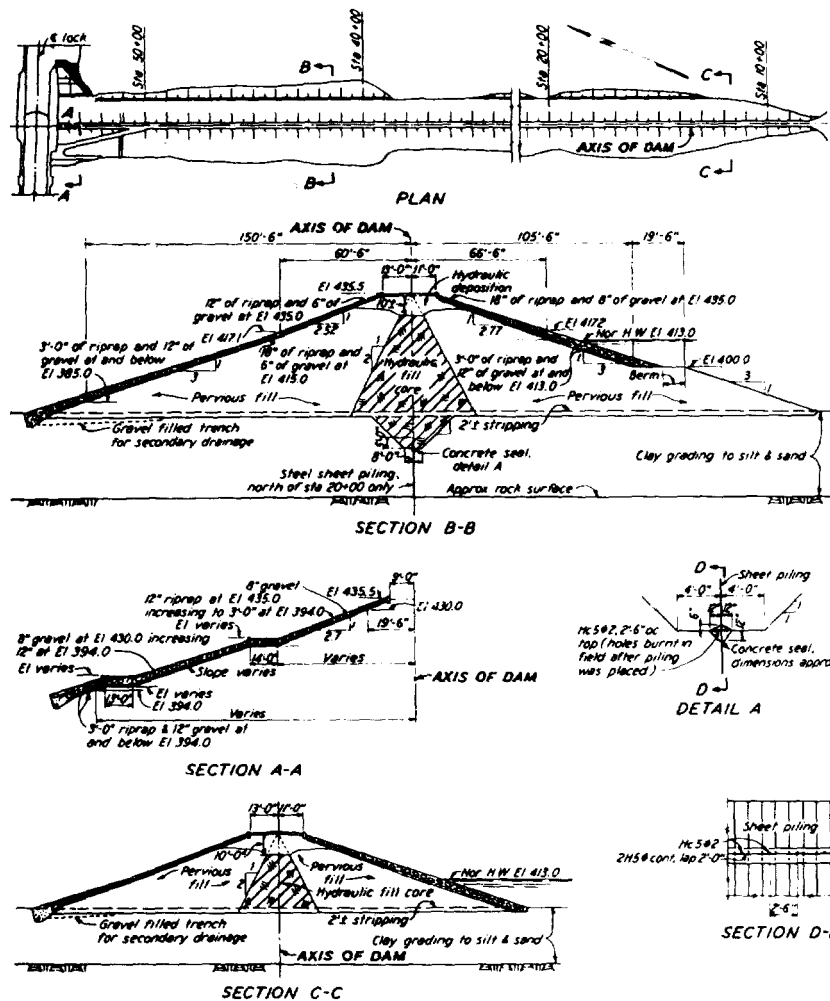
Plan and typical section of Pickwick Landing Dam south embankment.
